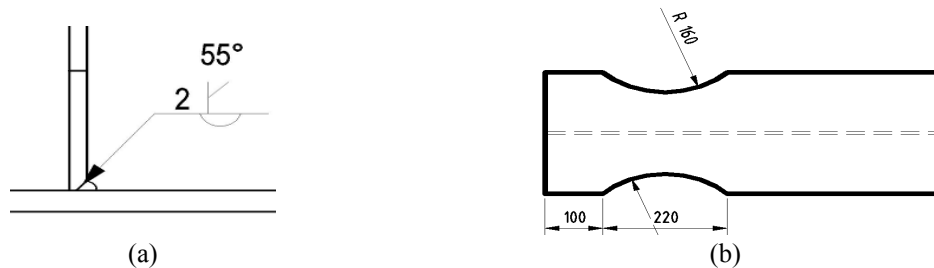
Detail of the beam-to-column weld and geometry of the reduced beam section
